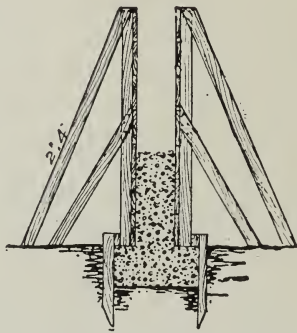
Cross-section of Concrete Wall Footing, Wood Forms, Studs and Braces.
